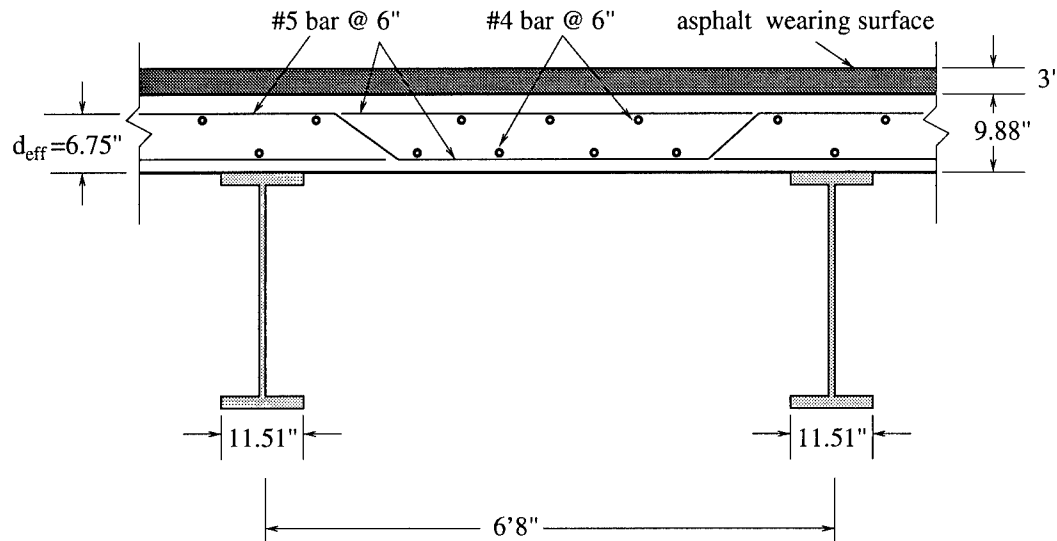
Cross Section of Concrete Slab Showing Placement of Reinforcement
